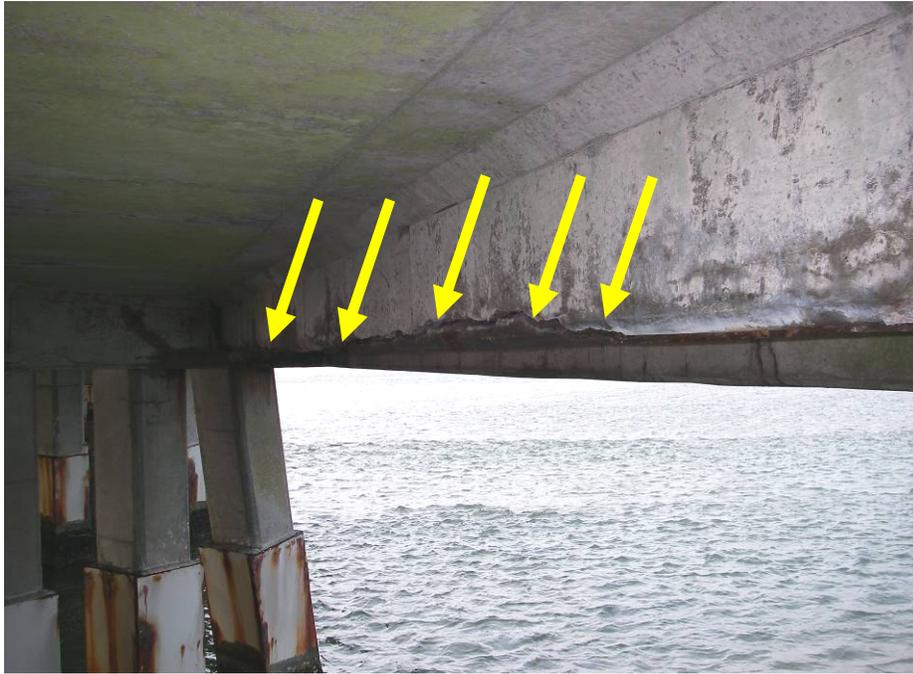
Span 33, north sidewalk soffit. View of the typical spalled areas, failed shotcrete repairs, and delamination.
